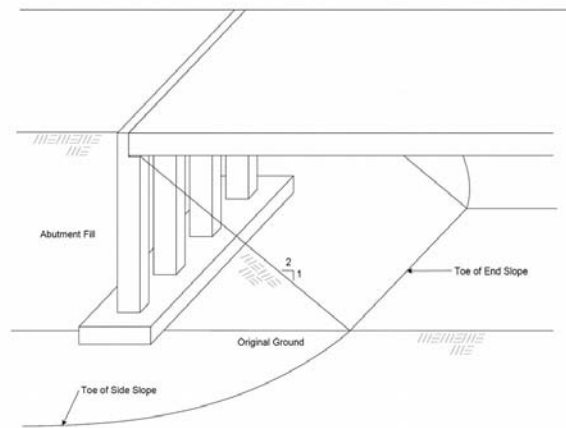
Spill-through abutment on combination strip footing (FHWA, 2002c).
